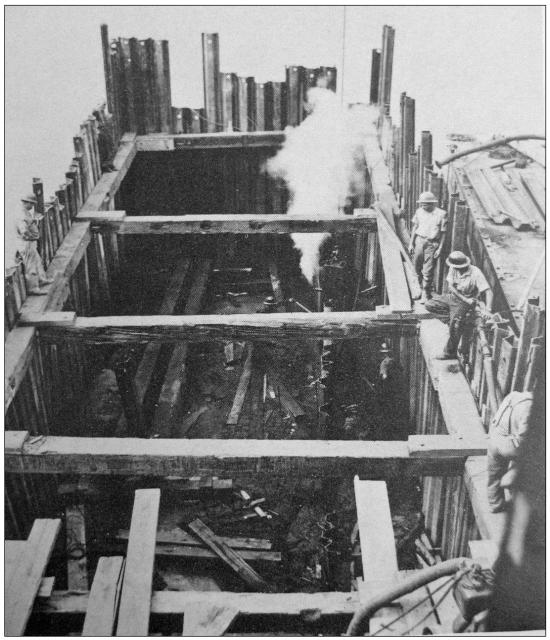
Photograph, ca. July 1950, showing construction and dewatering of steel sheet-pile cofferdam for concrete pier. Source: *New Hampshire Highways*, June 1951.
